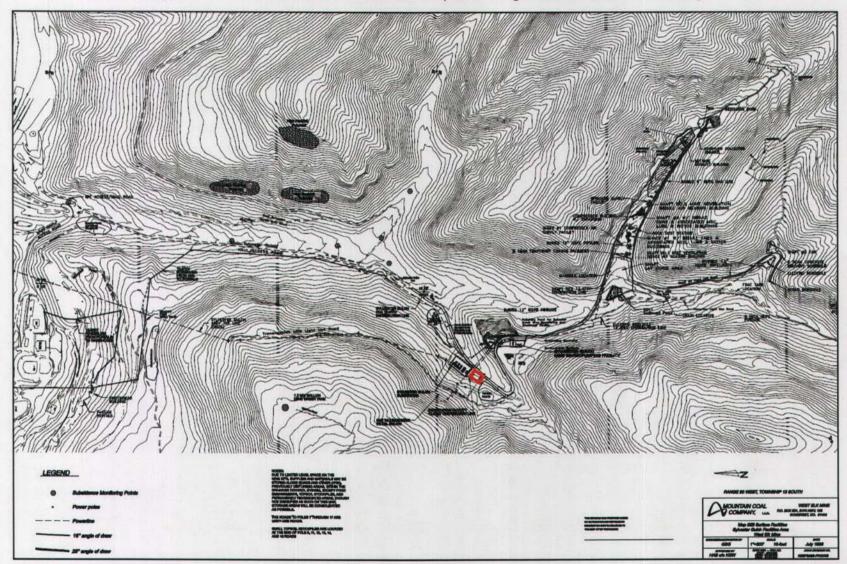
West Elk Mine Surface Facilities (Generating Facilities Location Shown)
